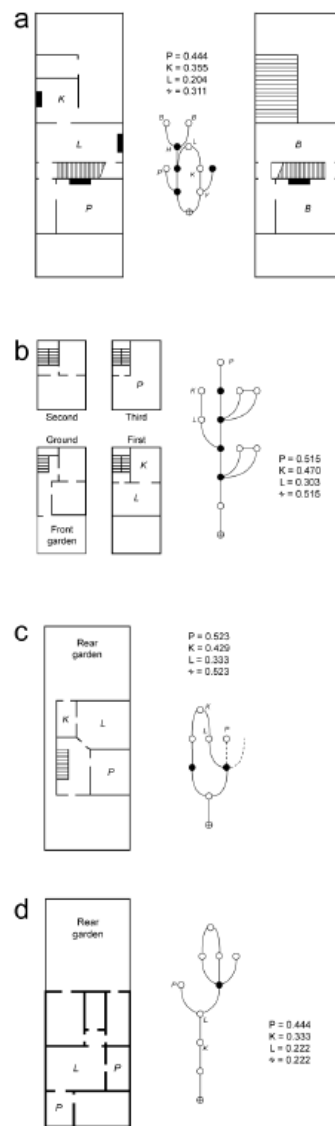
(a) Plans of a Victorian cottage; (b) plans of a converted house in Camden Town, London; (c) plan of a 1950s local authority house; (d) plan of a converted flat in Islington, London.
